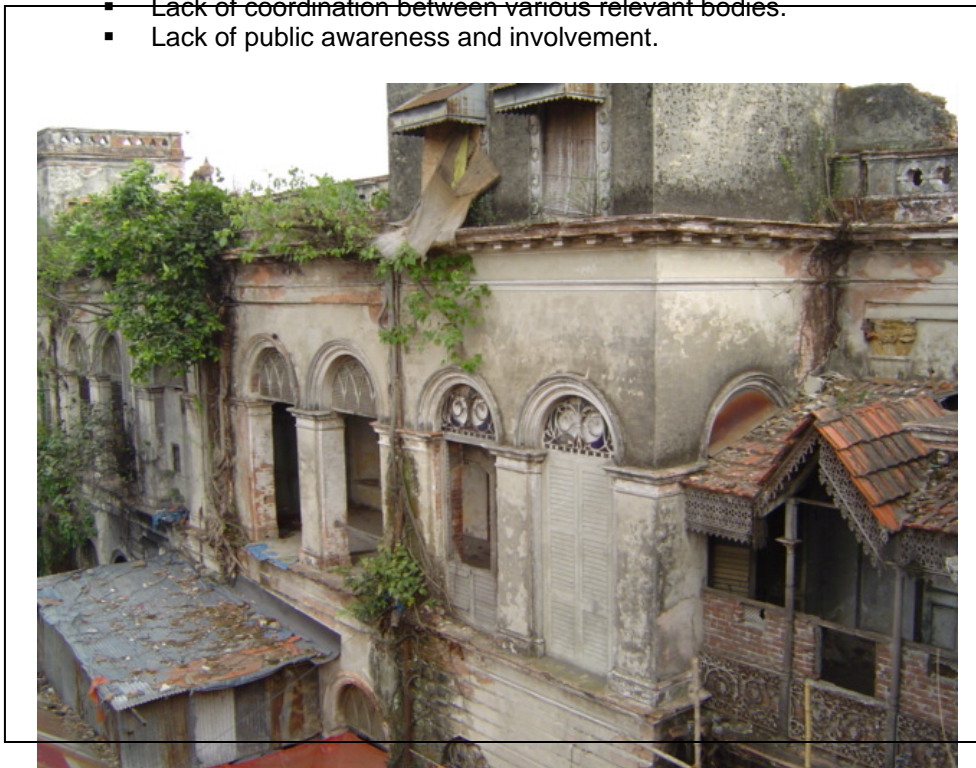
Damage in wall surface and adjacent illegal structures(source: student's report)
